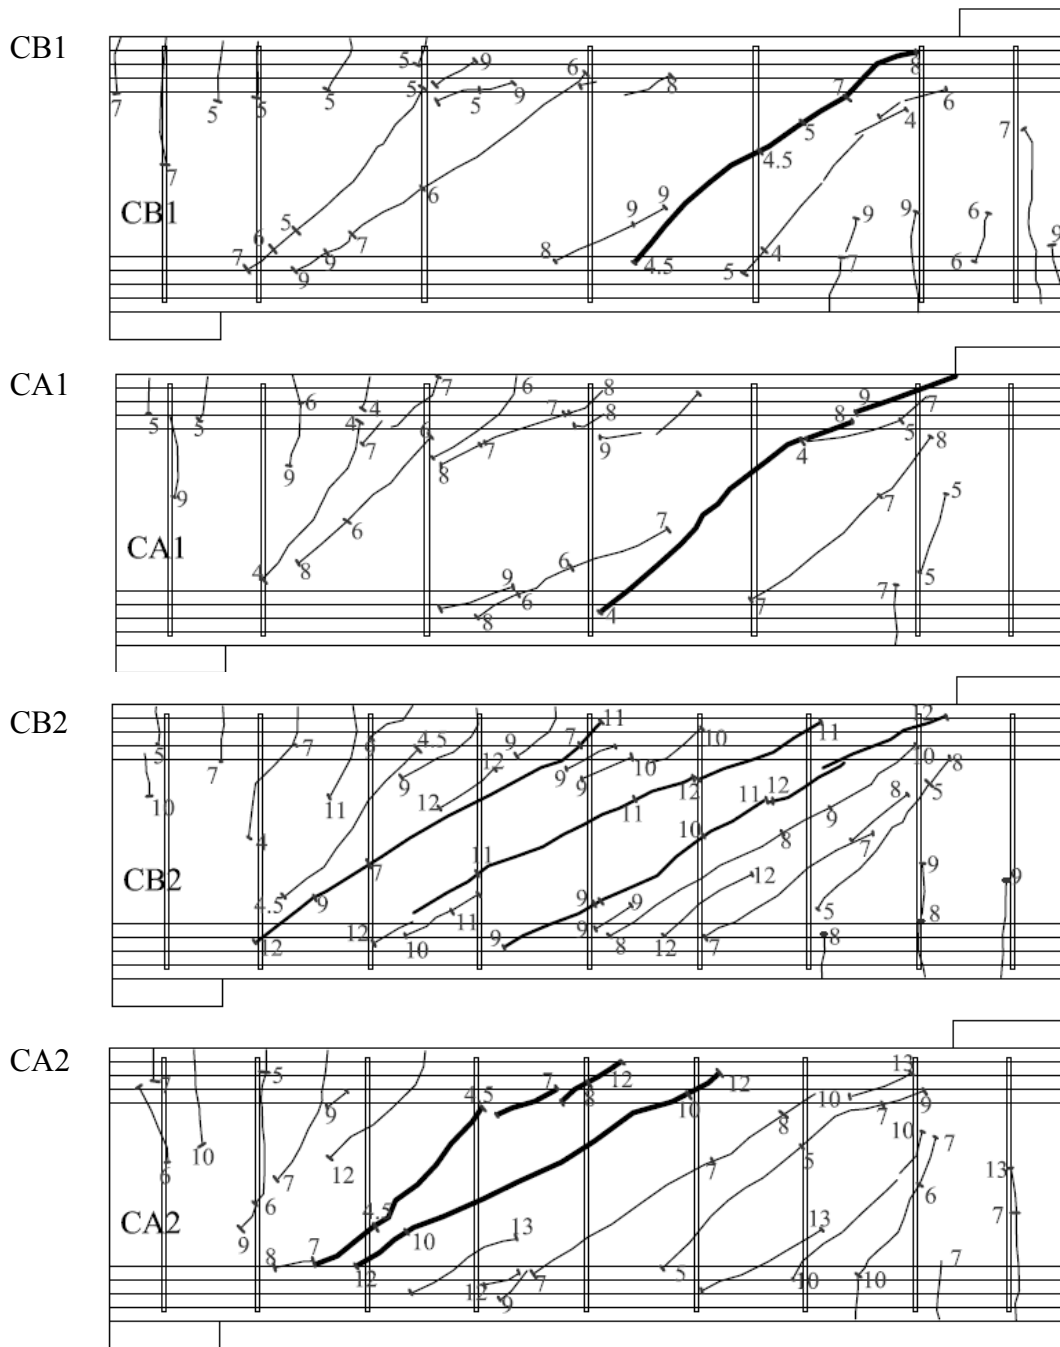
Typical crack pattern in beams B and C (beam CA2)
